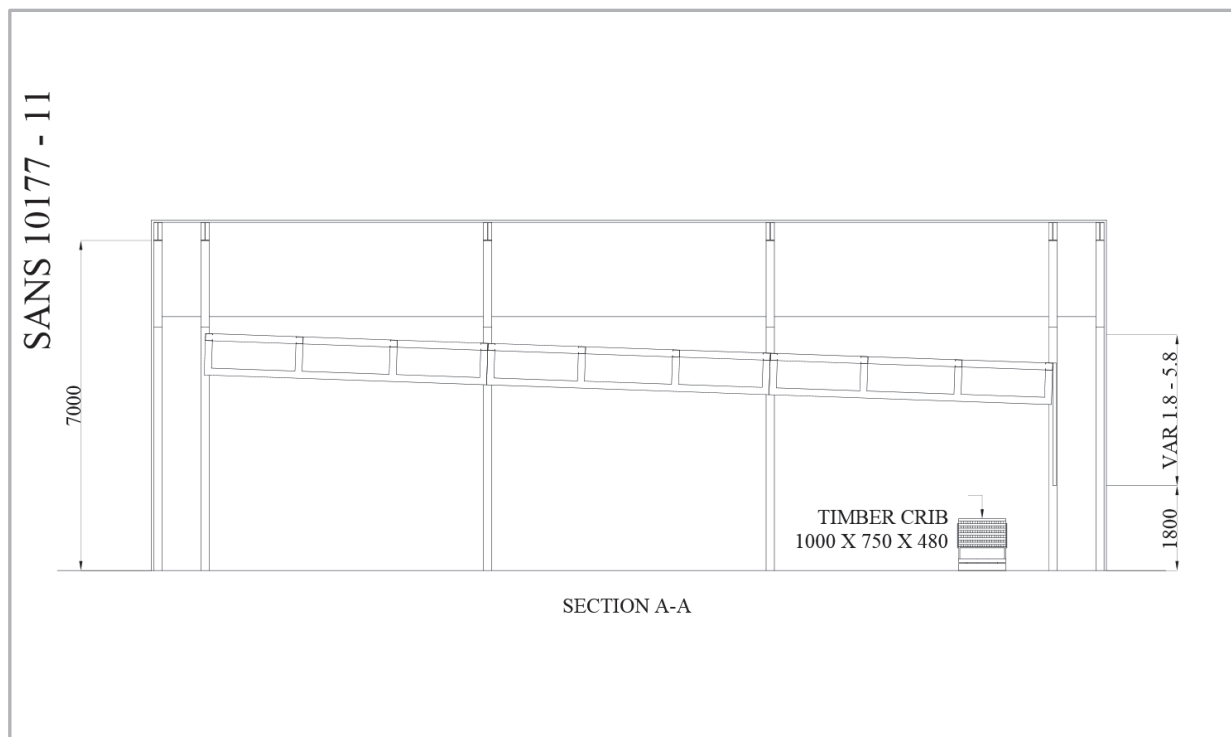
Typical roof test installation in the SANS 10177 – Part 11 facility
